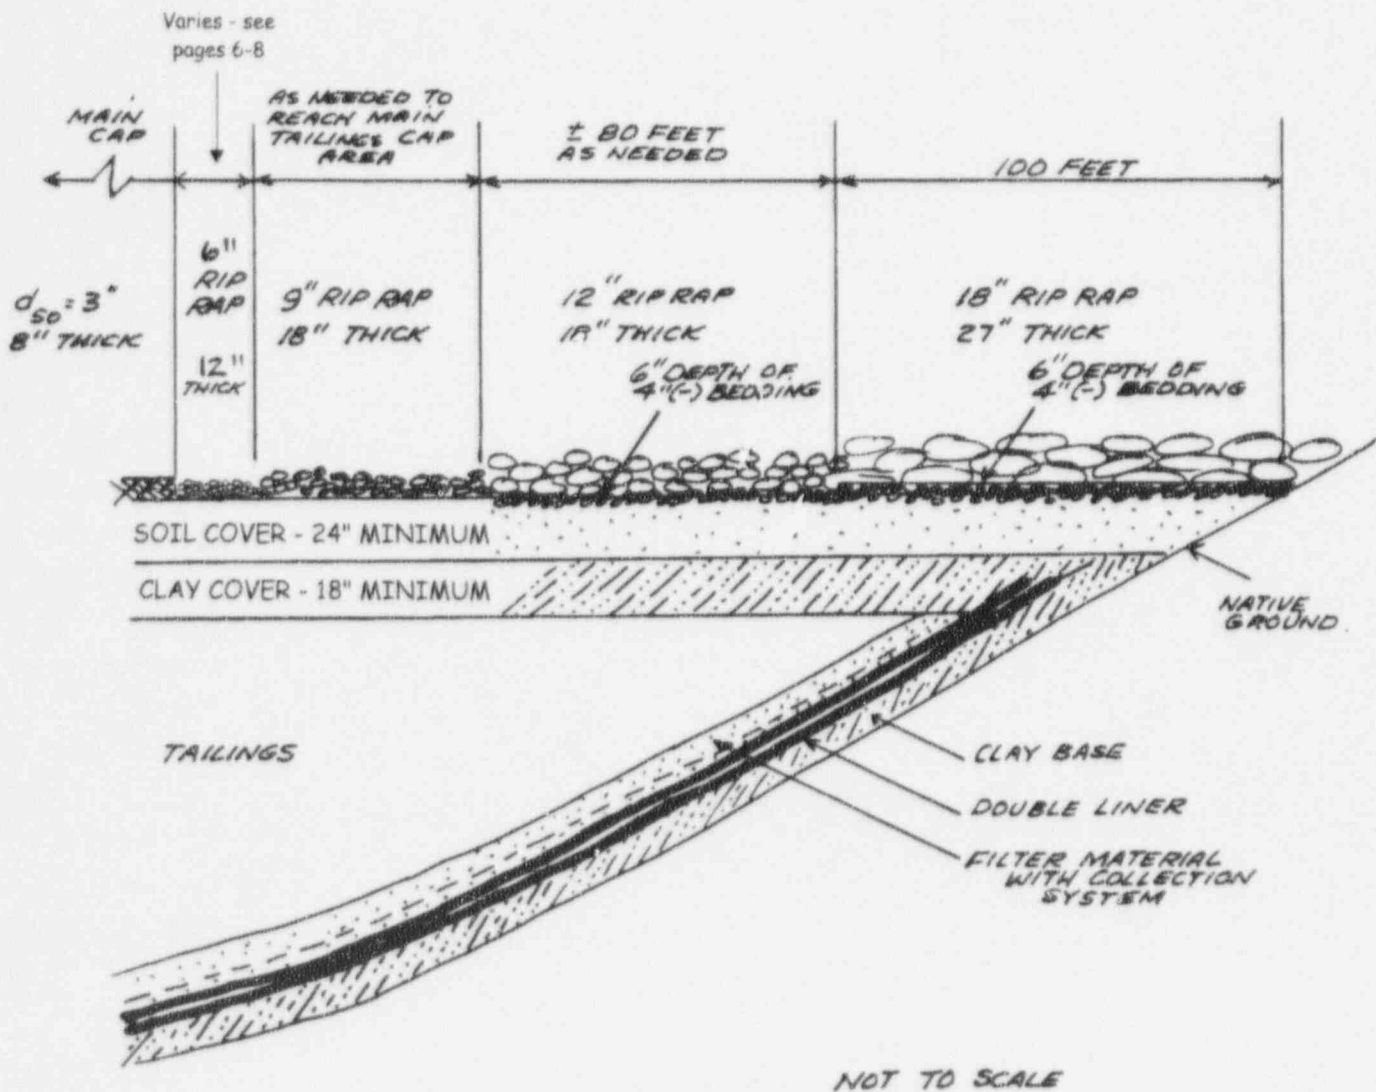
Section (E-E') Longitudinal section of the cap in the drainage area in the NE corner of the impoundment. (See Figure 3, Reclamation Plan Map and Figure 2 for run off area.)
